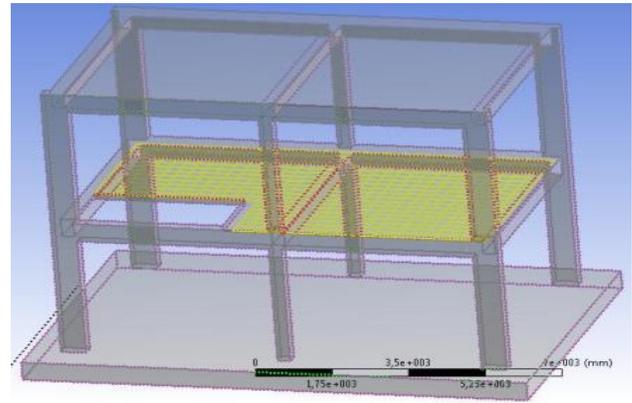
3D finite element model of a two-storey reinforced concrete building
